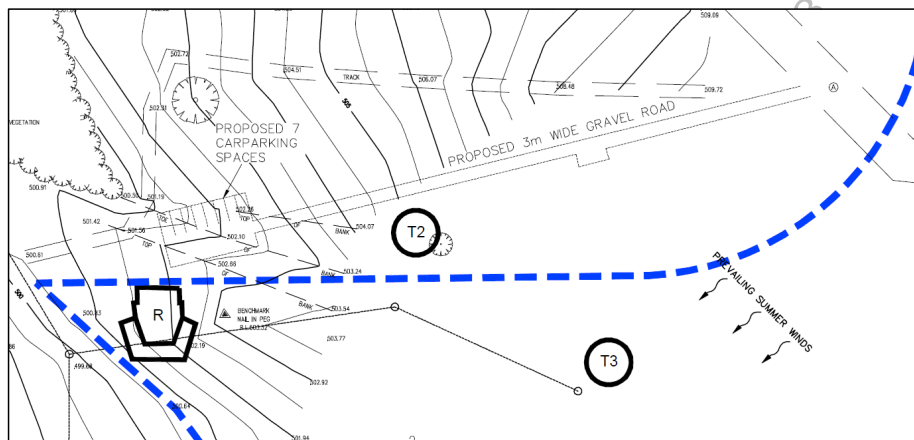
Extract of the Site Plan showing the location of the proposed access track and onsite parking
